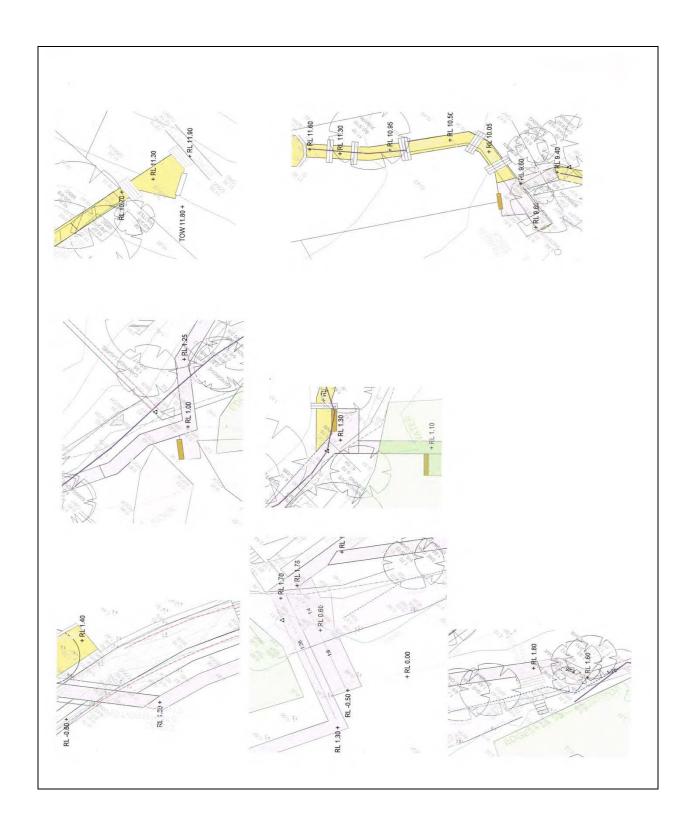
Ryde Riverwalk Landscape Master Plan – Detail Design at Ross Street.
